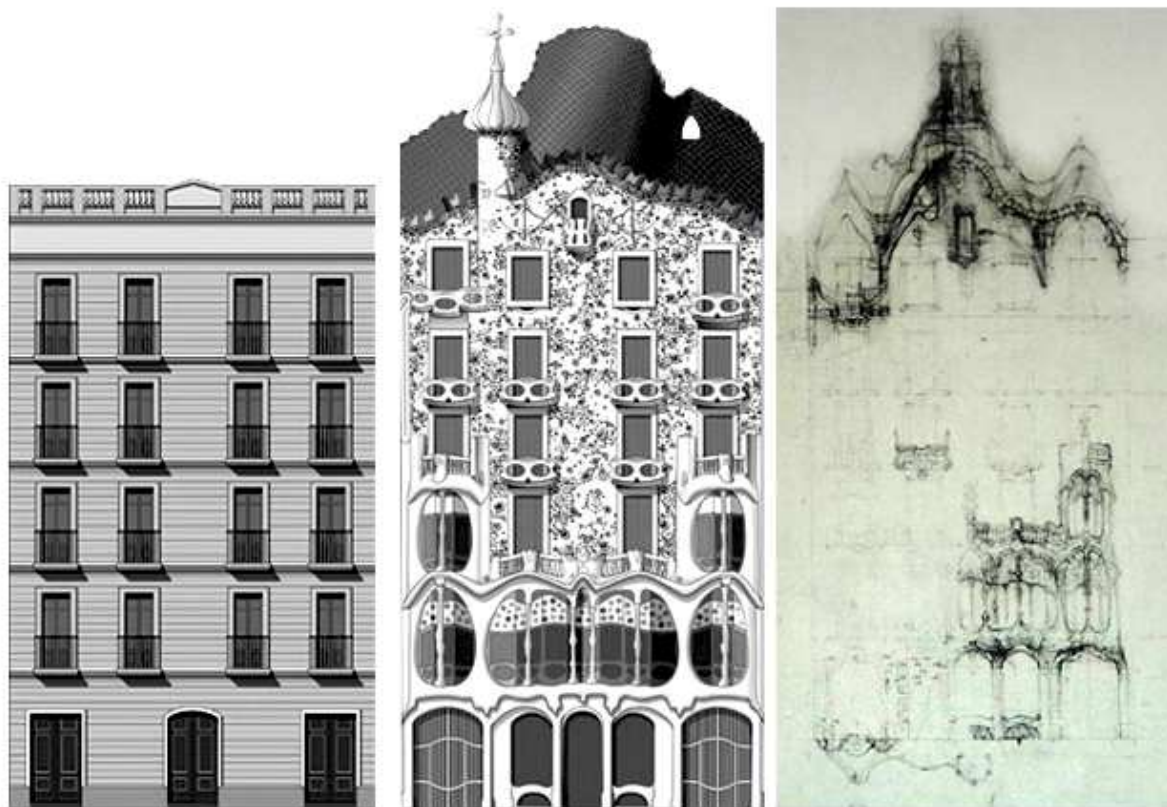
Façade of the House Batlló before and after the refurbishment of Gaudí, and sketch of elevation for the building remodeling 1904-1905.
